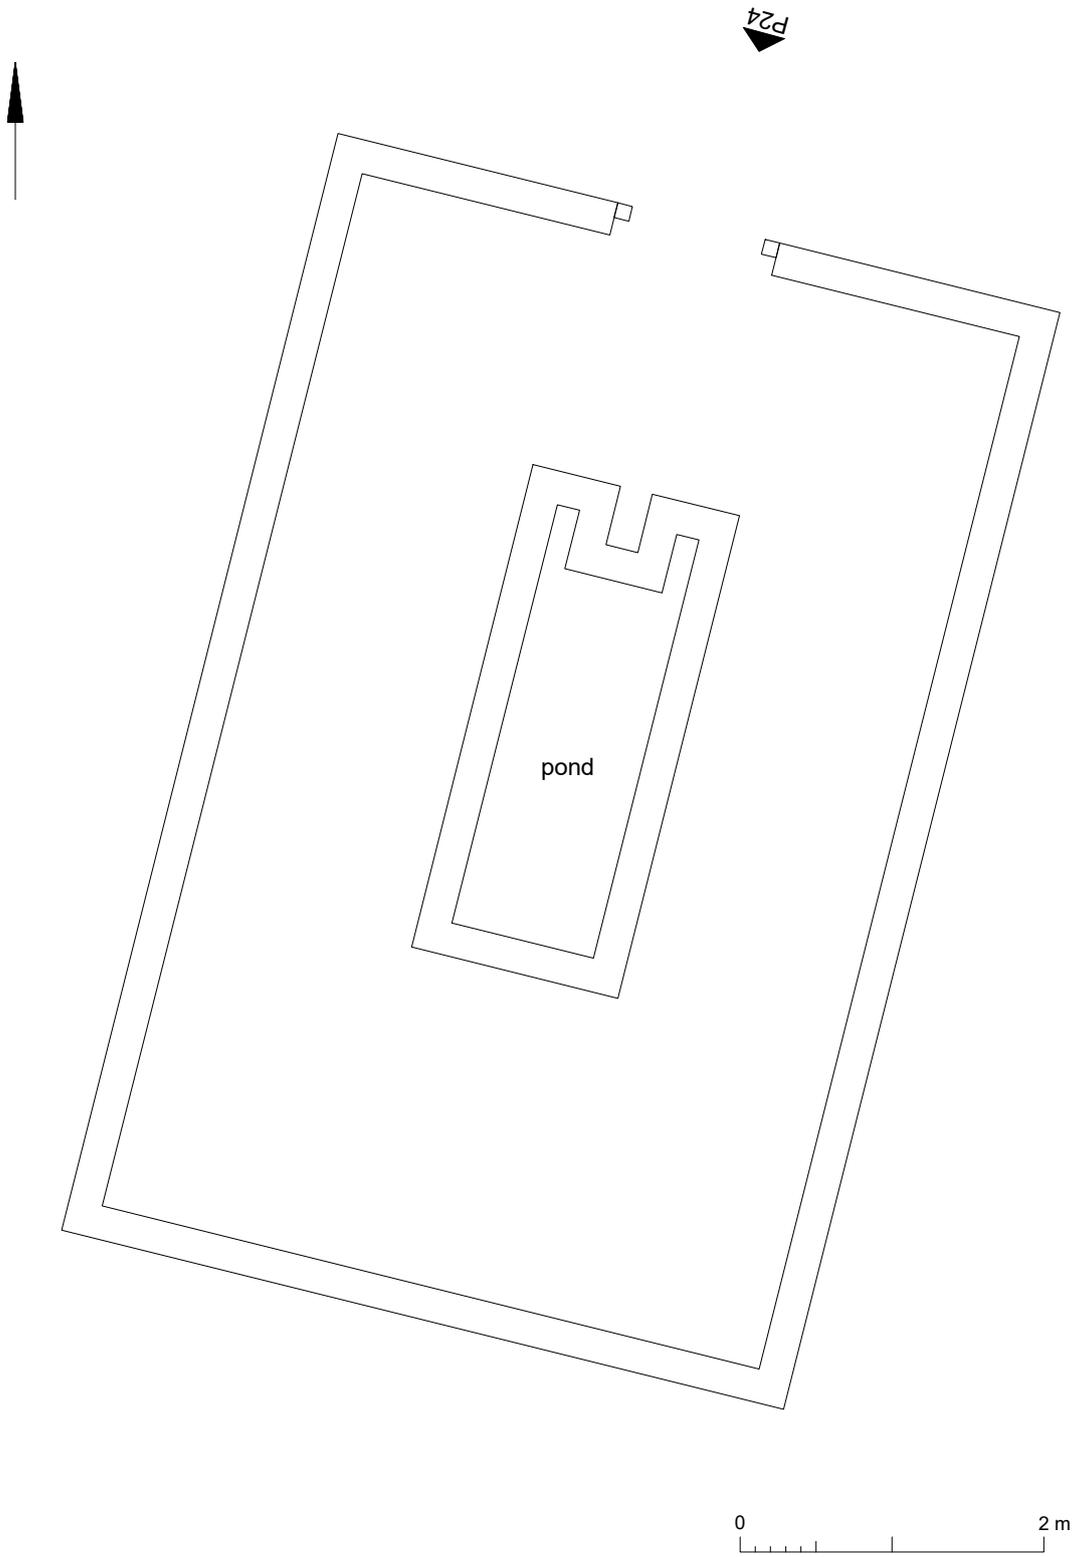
Glasshouse base A floor plan. Location and direction of photographs reproduced in text shown.
